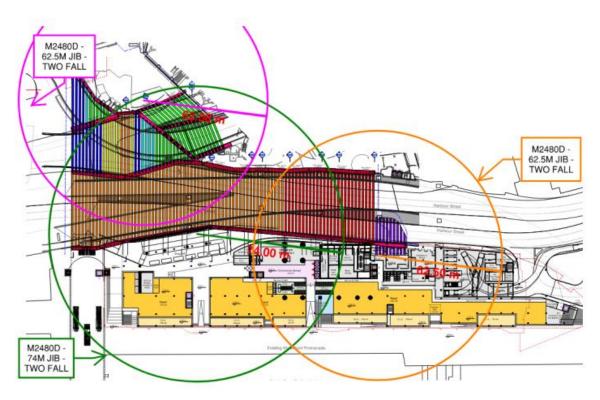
Extent of Precast Beams for Land Bridge and Associated Crane Location
